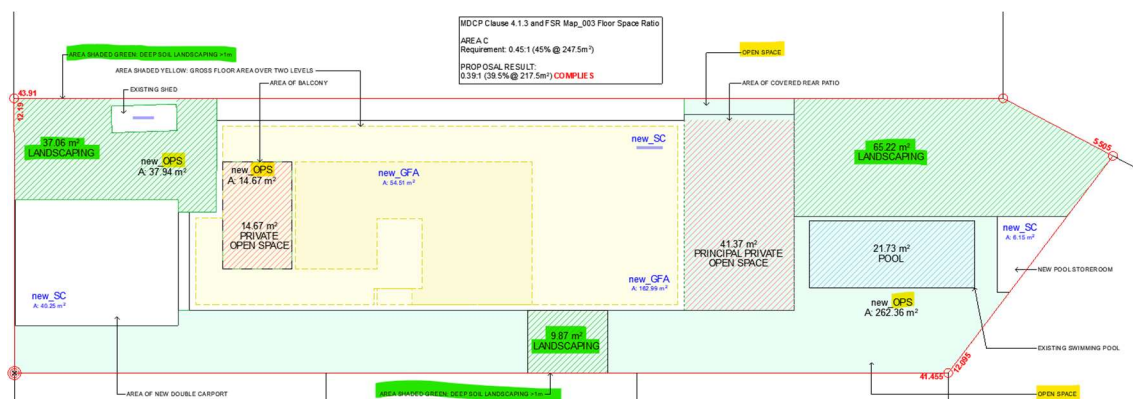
Extract of Plan DA-105, Schedule of Areas Plan.
